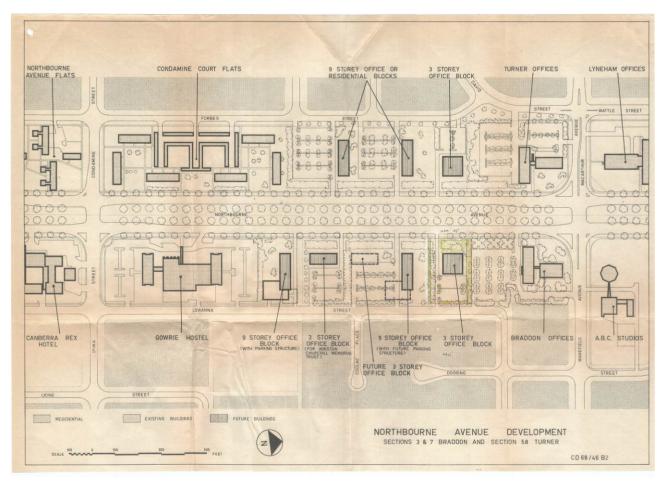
NCDC Plan CD.68/46B2 (NCDC file SP 2378 part 1) – the concept had not been formally accepted by the NCDC by the end of 1968 when Boyd started designing Churchill House, but it still formed the basis of planning.
